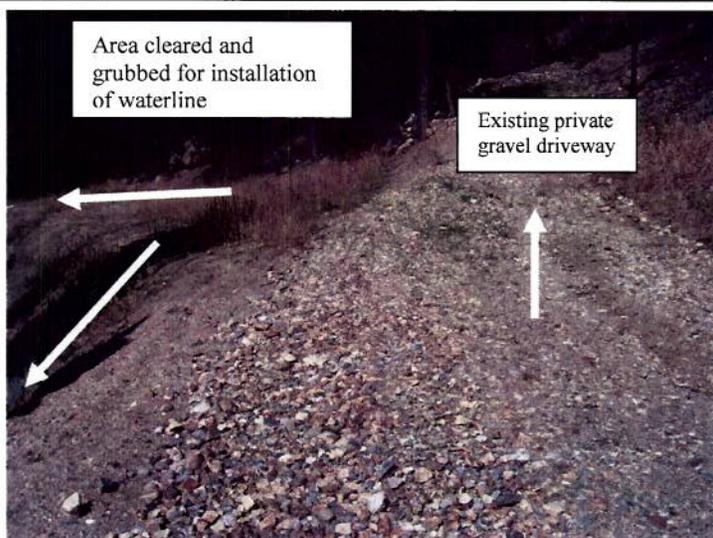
Disturbance located along the southeast side of the project, just east of the entrance to the constructed Glacier Park Storage facility
